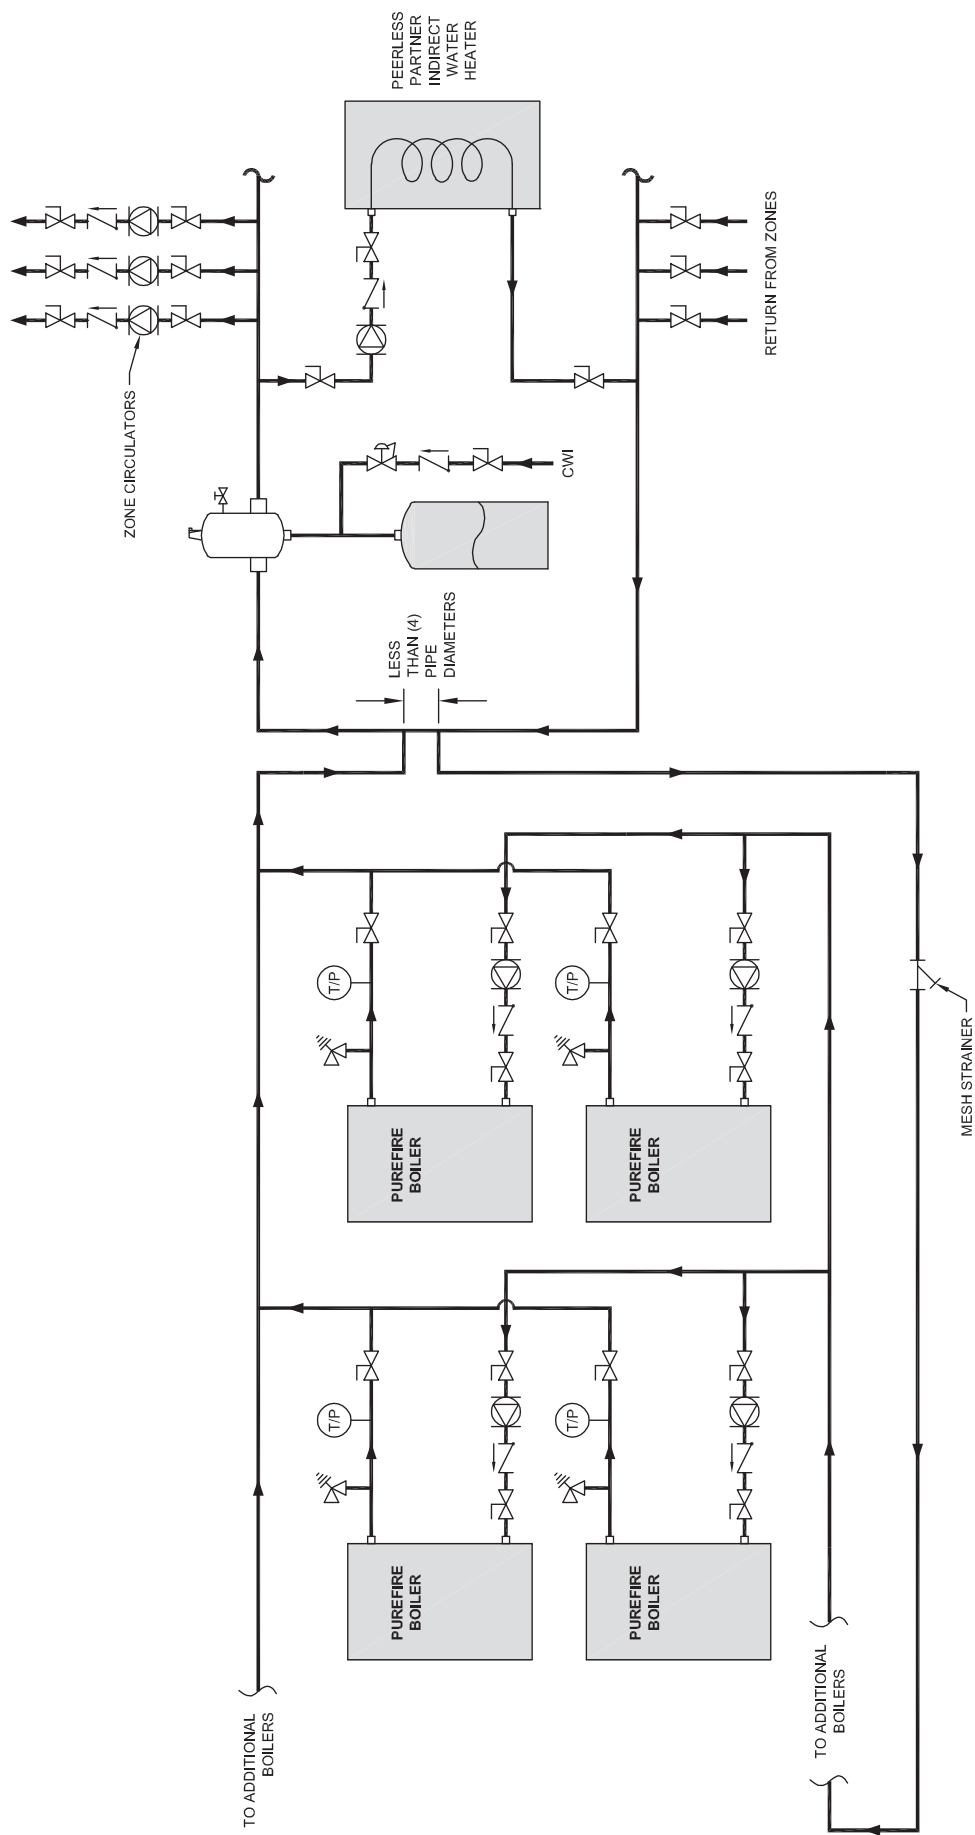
Recommended Piping – Multiple Boilers with Multiple CH Zones & One DHW Tank
